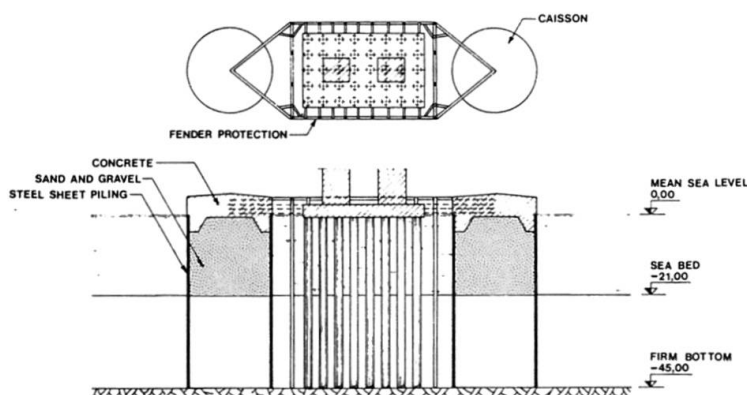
Artur da Costa e Silva Bridge (Rio-Niteroi Bridge): pier protection. Figures based on Der Bauingenieur, jan. 1973.
